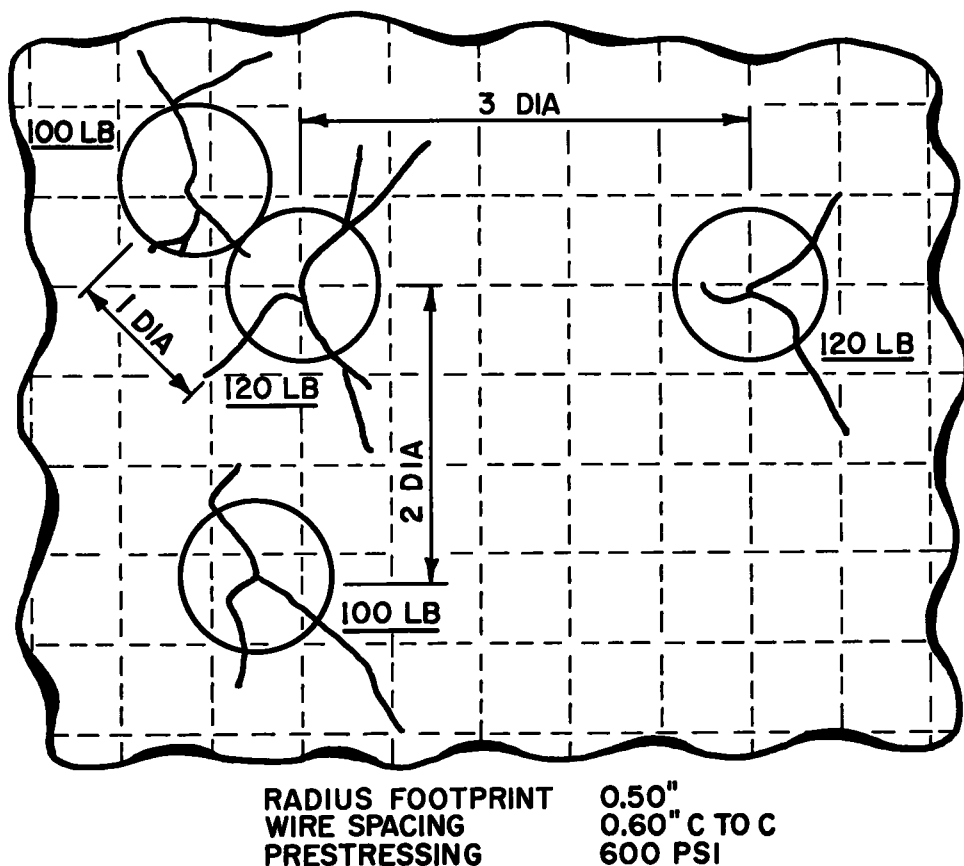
Formation of independent plastic hinges for interior loading - Slab No. 14.
